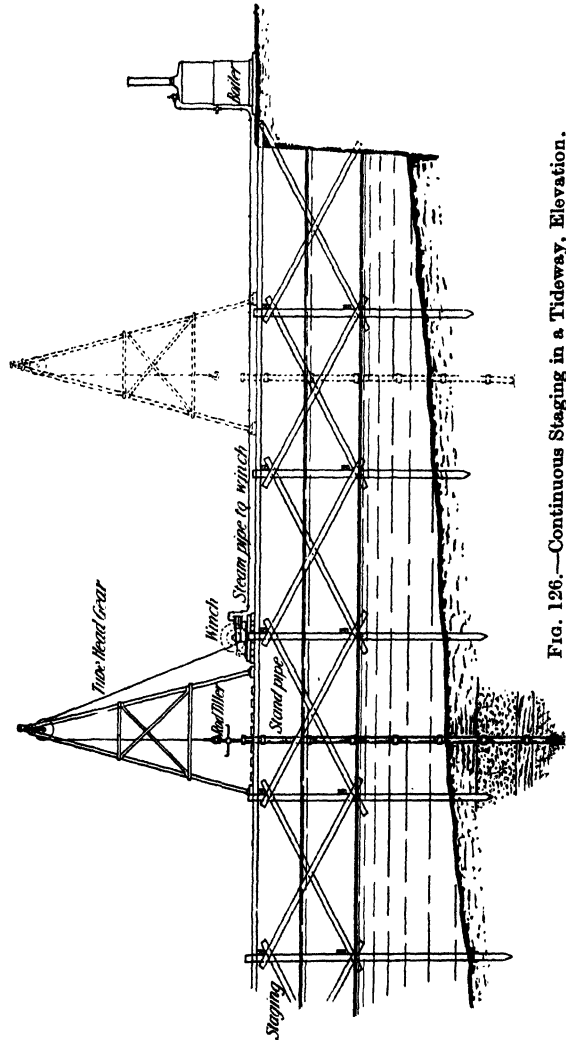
Continuous Staging in a Tideway, Elevation.
